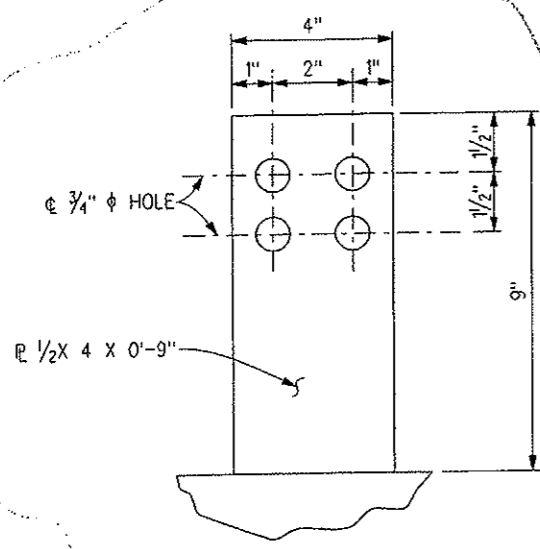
DETAIL AT TOP CONNECTION (SOUTH TUNNEL - INTERIOR ZONE)
